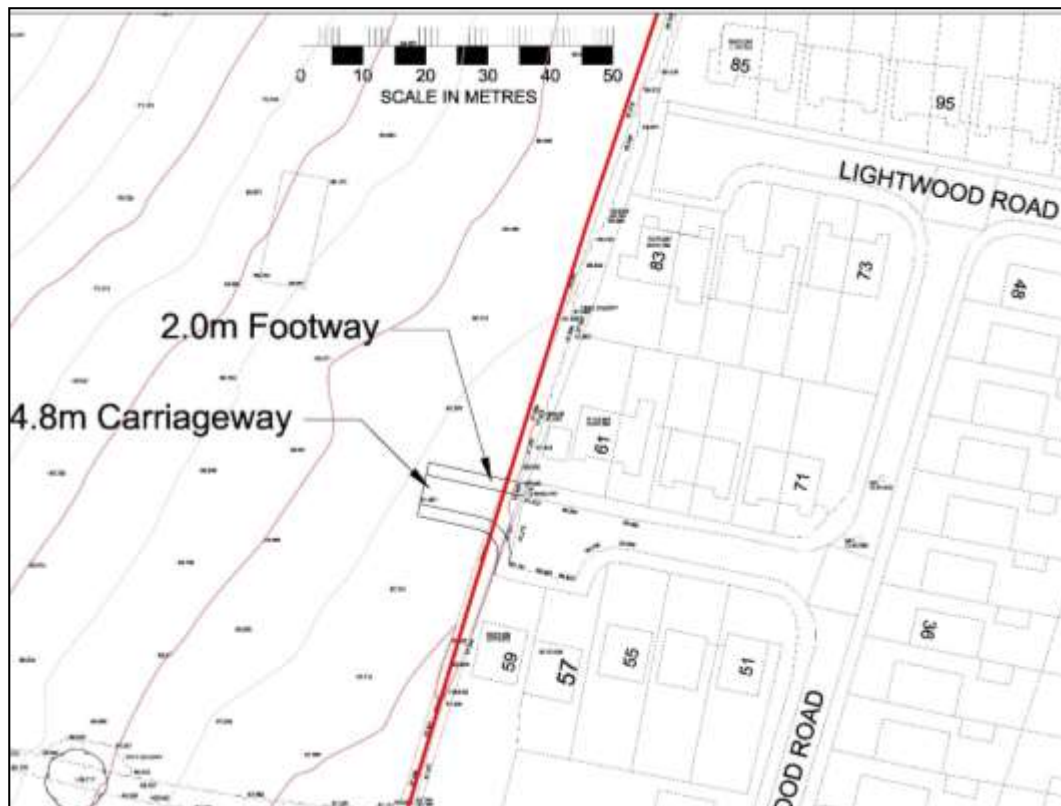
Lightwood Road Proposed Access Arrangements
